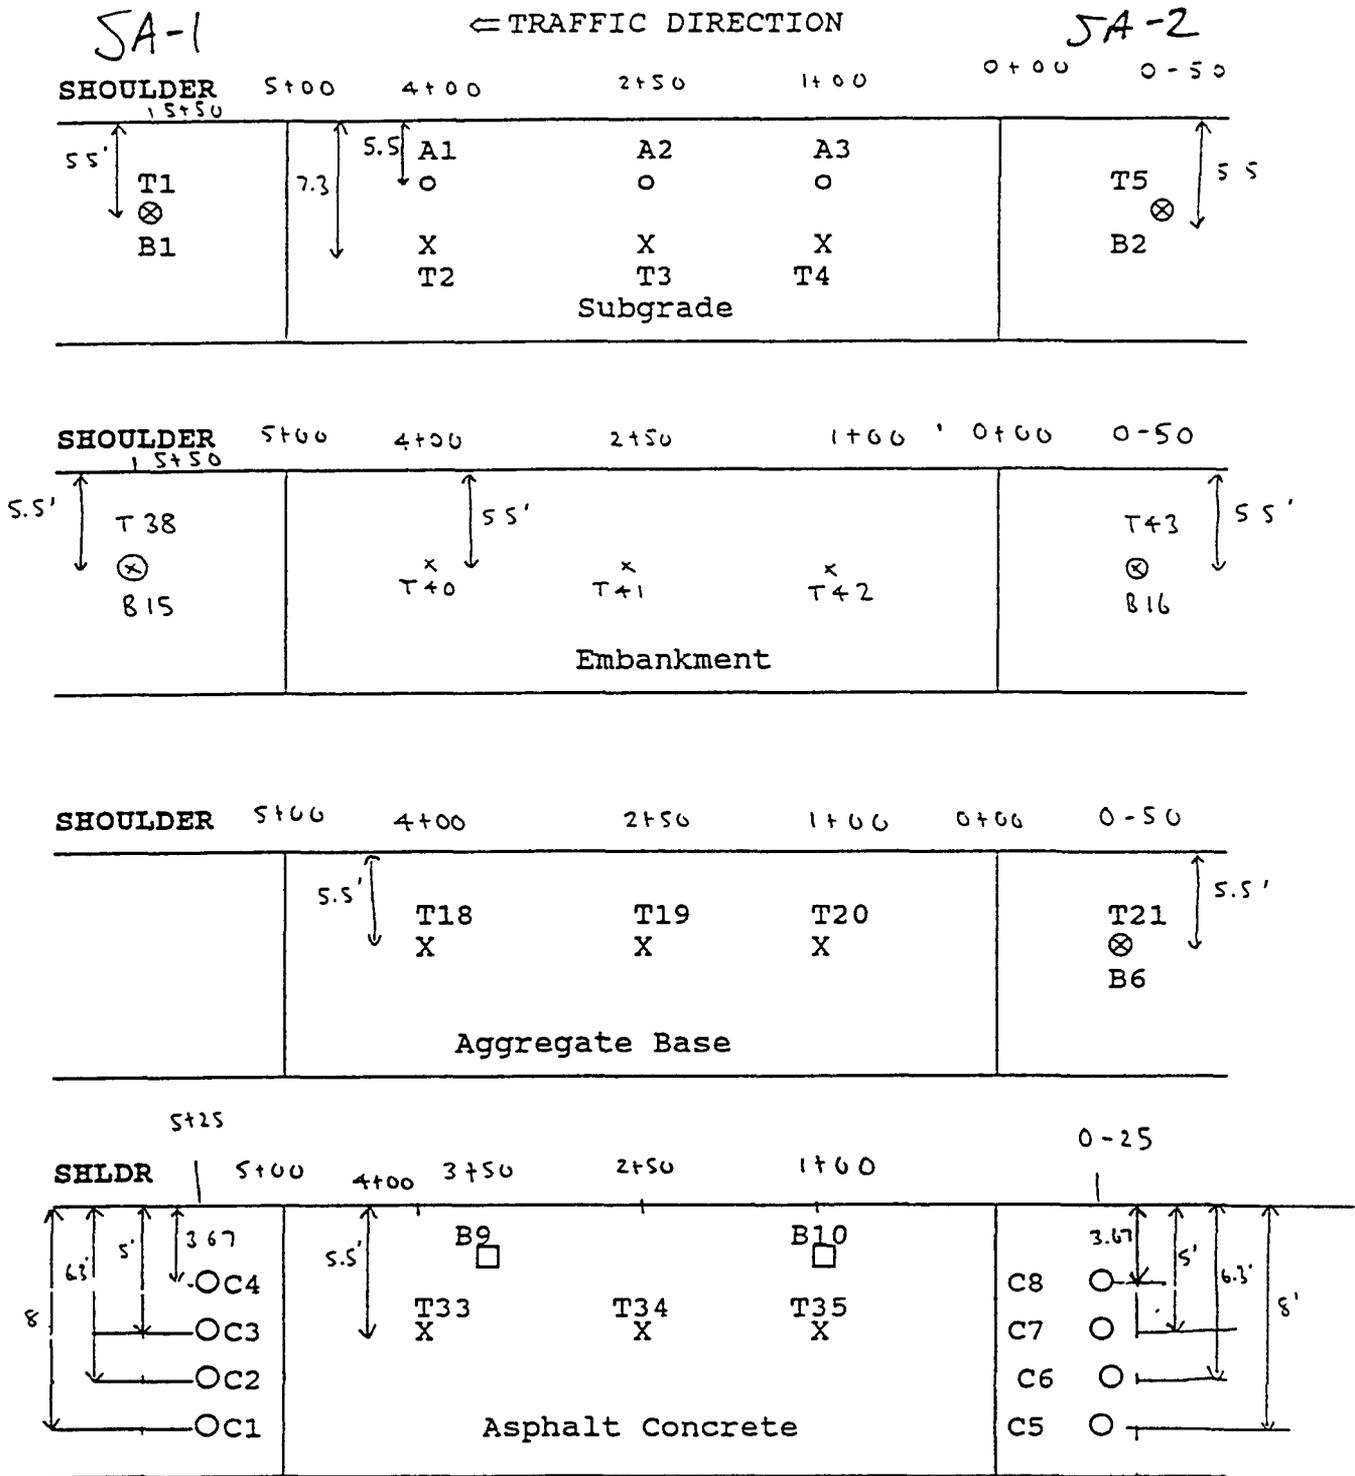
SAMPLING AND TESTING FOR SECTION 390804
